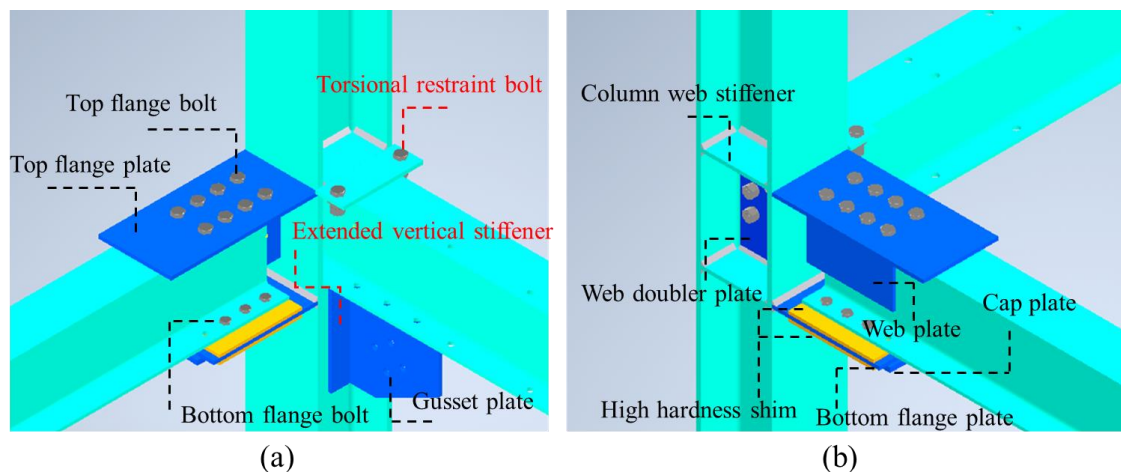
3D View of SHJAFC (a) Inside and (b) Outside of the Frame
